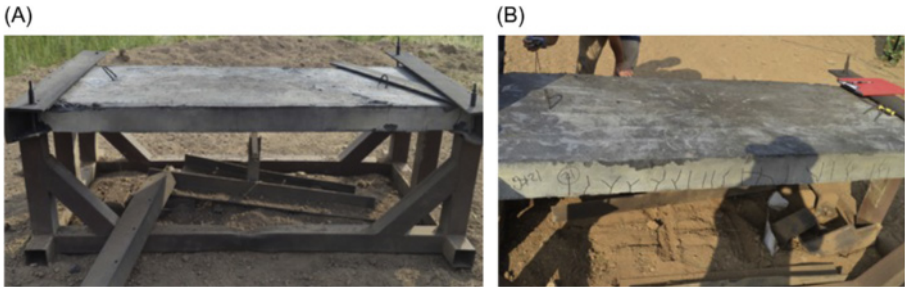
SWM-SF slab after 12 kg TNT detonation from 1.5 m standoff distance: (A) SWM-SF slab after test and (B) crack distribution on the slab.
